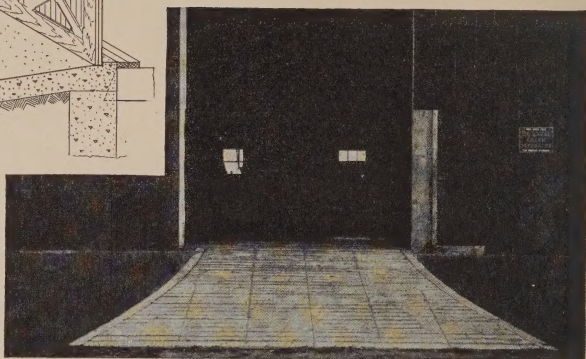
At left: Section showing construction of concrete barn entrance. Notice apron at front. Concrete does not need to rest on foundation wall as shown, but if more convenient may merely butt against it. For details on barn entrances, see page 31.
